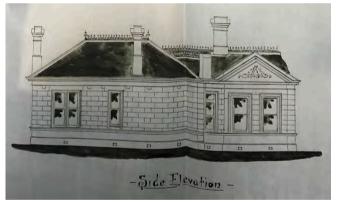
Extract of original building plans showing the additions to Talana in 1914
